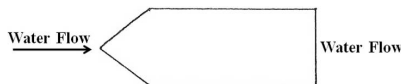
Sharp point angled piers (breakwater forms), Khajou Bridge, Isfahan.
